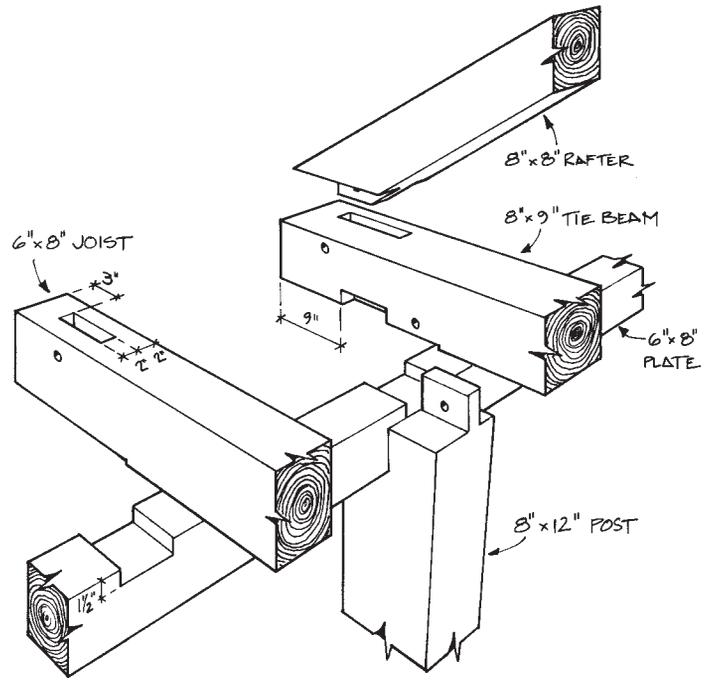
In this early 19th-century 32x40 two-story house in Washington, Massachusetts, the rafters tenon both into tie beams and joists, which extend 9 in. past the plate for a boxed-in cornice. The principal tie beams sit on tapered posts and are cog-lapped over the plate. The 6x8 joists do not run the full width of the house but frame into a central summer beam. They are notched through the plate without cogging. The roof has purlins framed between principal rafters and supporting the commons at mid-span.
